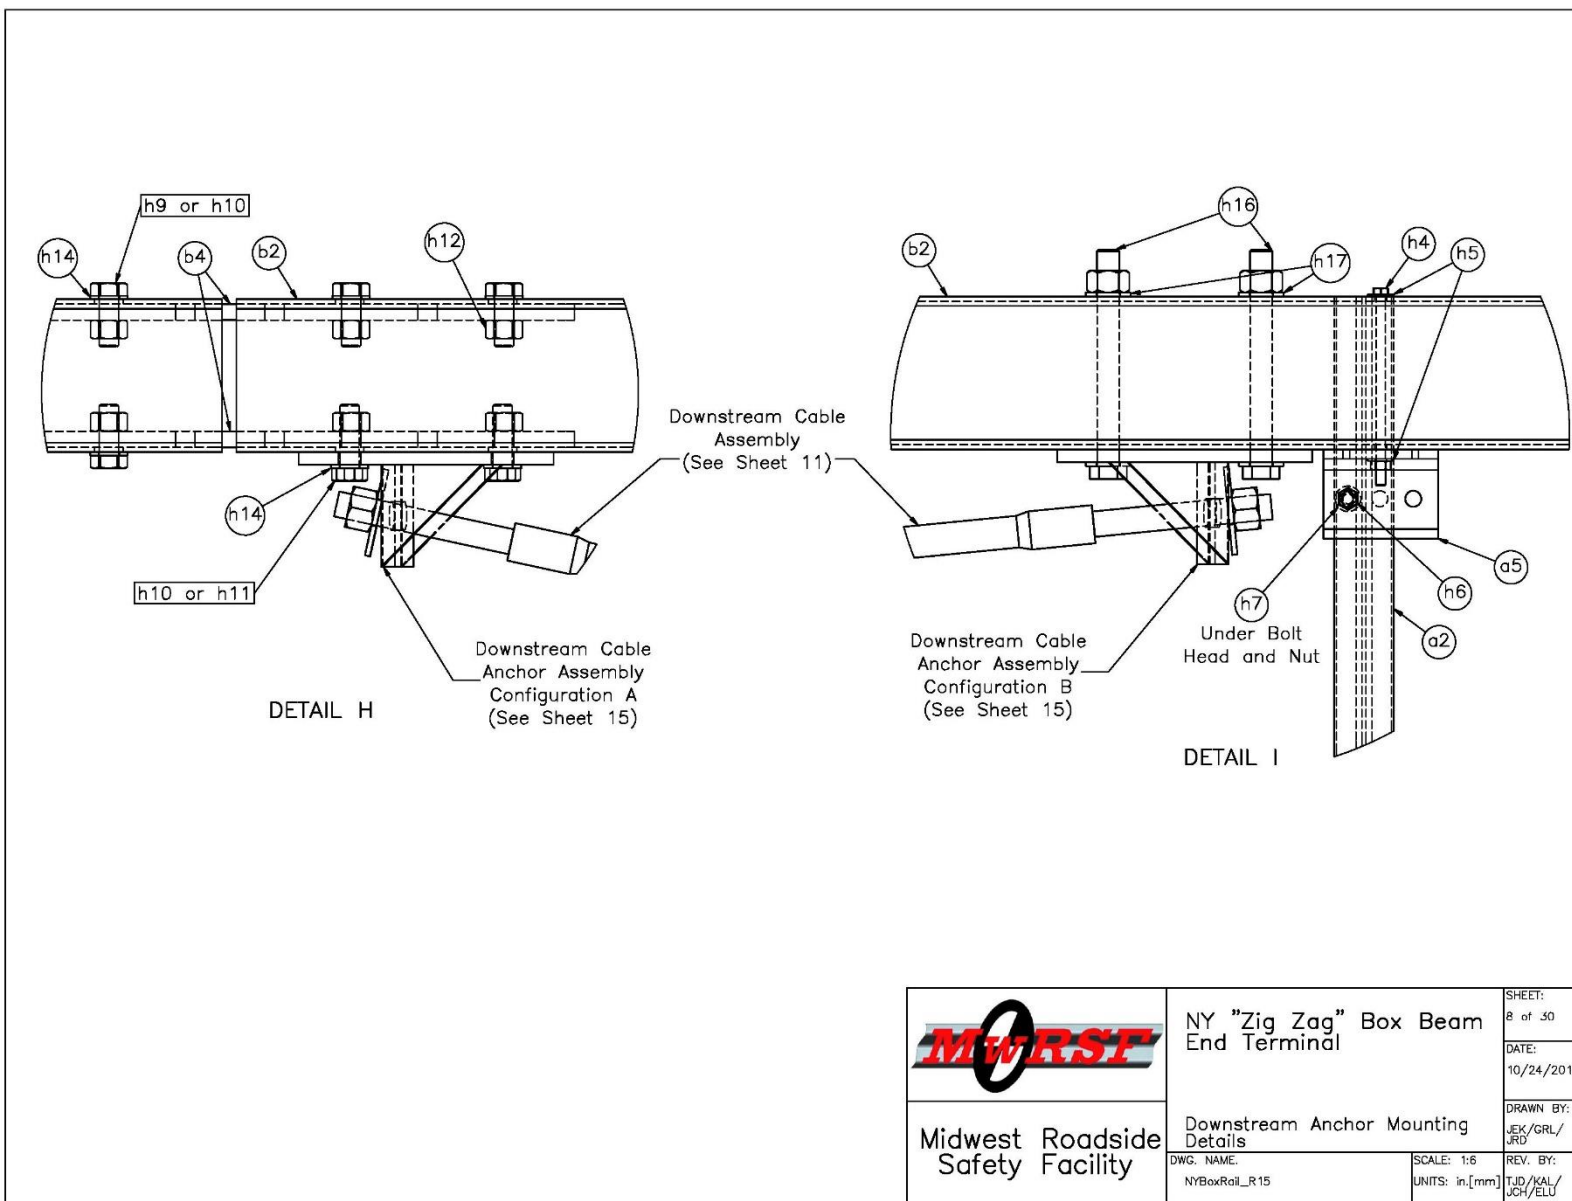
Downstream Anchor Mounting Details, Test No. NYT-1
